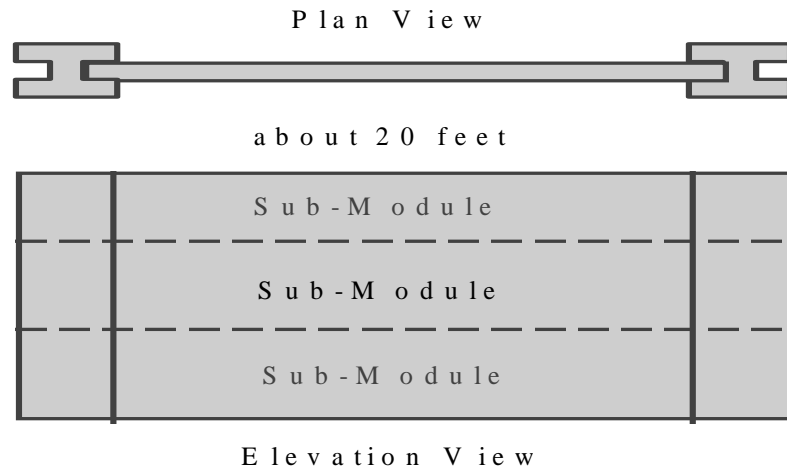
Schematic illustration of prefabricated, separate post-and-panel system for highway noise barriers
